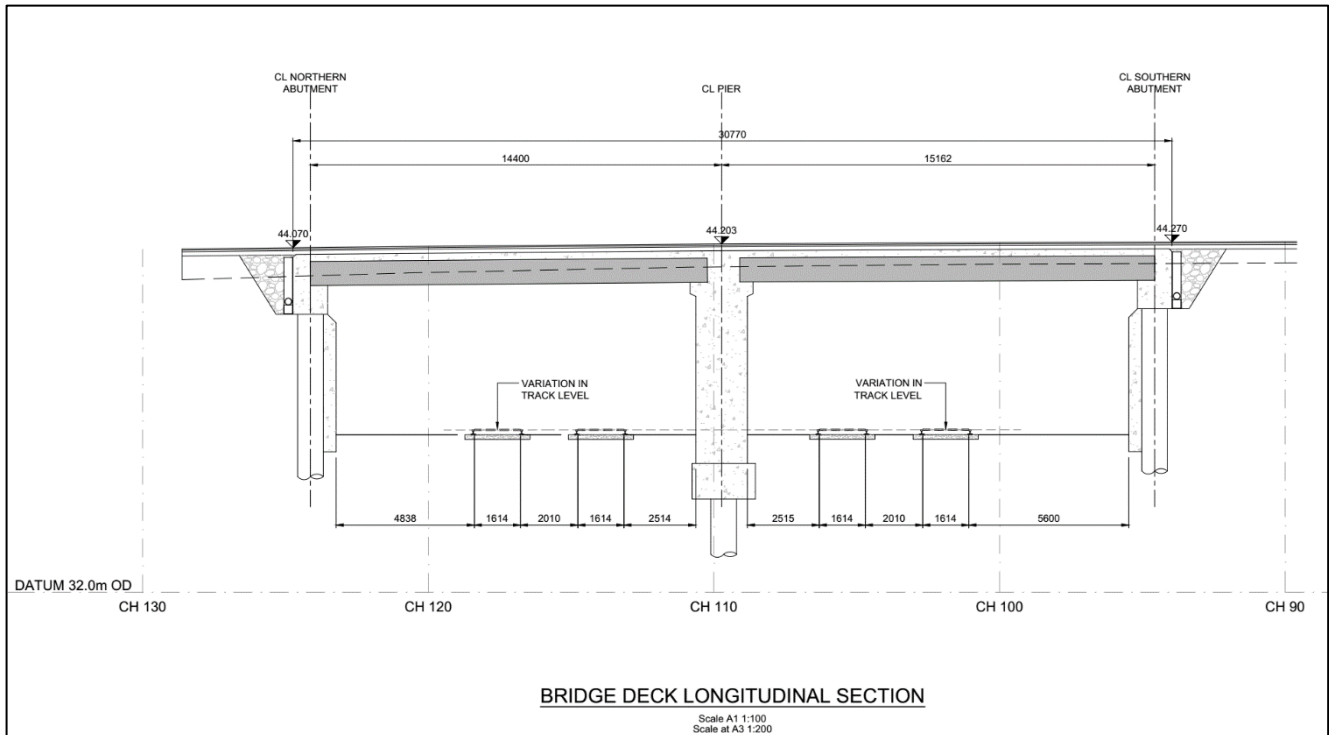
Kylemore Road Bridge (OBC5A) Bridge Deck Longitudinal Section – Facing East
